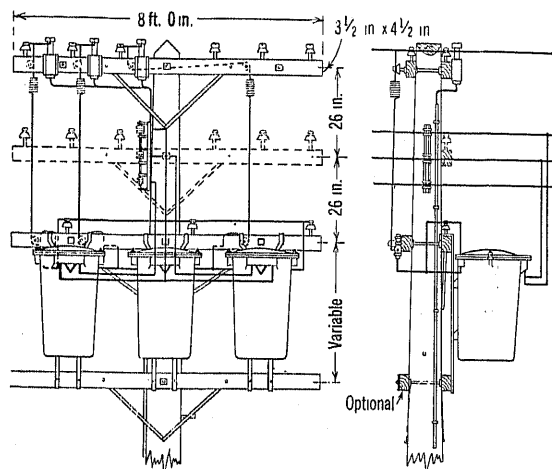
STANDARD TRANSFORMER MOUNTING OF THREE UNITS 5-15 KV-A.
